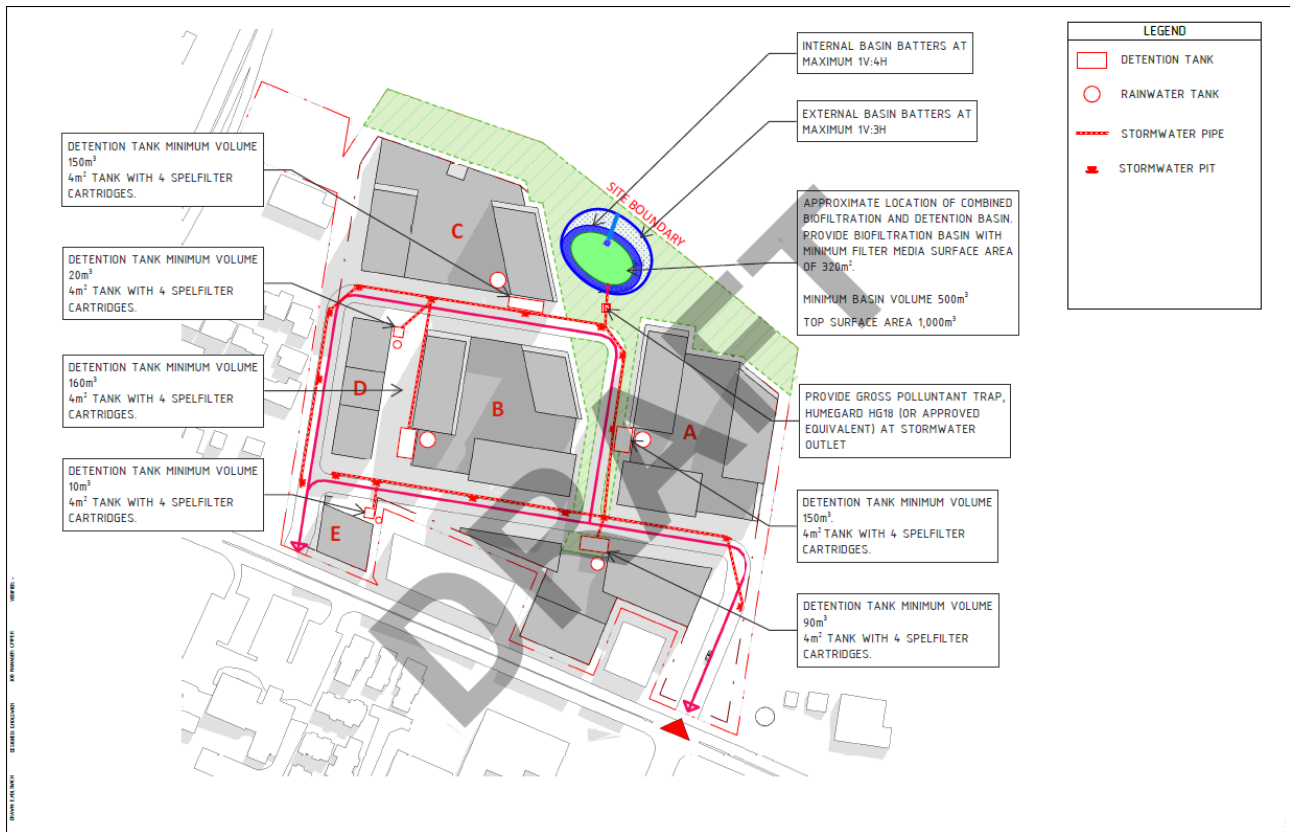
Proposed Site Stormwater Works (Northrop, 2023)
